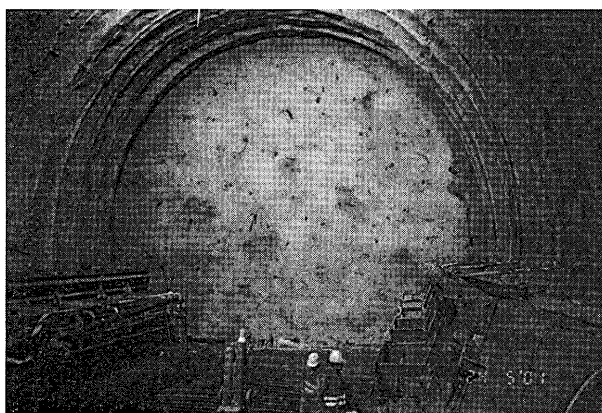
View of the tunnel face supported by temporary shotcrete before installation of the fiber-glass dowels
